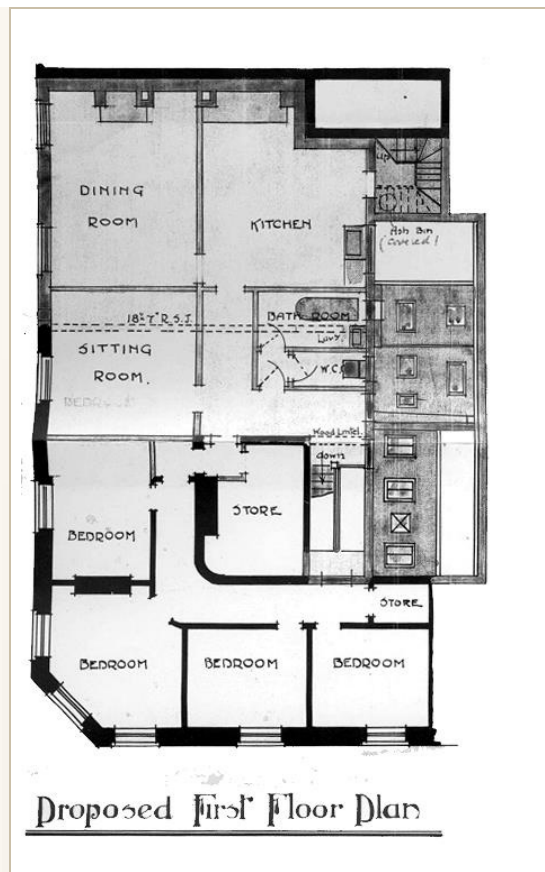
1911 architectural drawing, The George & Dragon, proposed first floor
